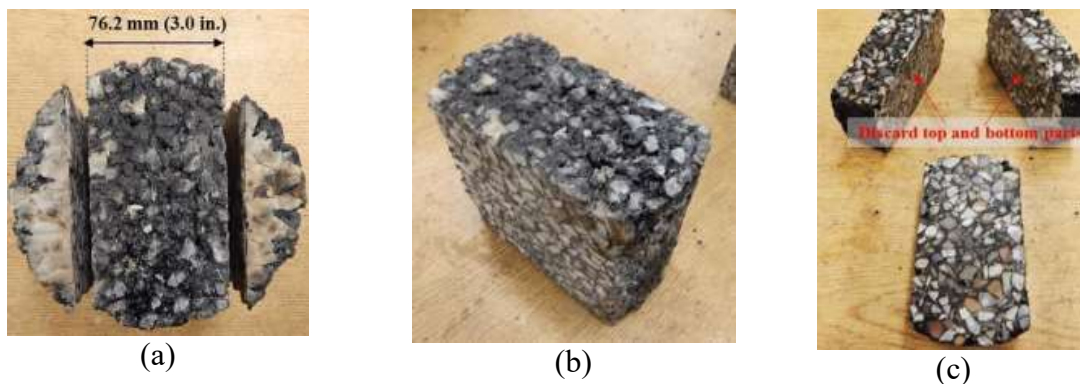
HMA OT specimen preparation: (a) cutting specimen perpendicular to the top surface, (b) after discarding the trimmed sides, and (c) trimmed final specimens.
